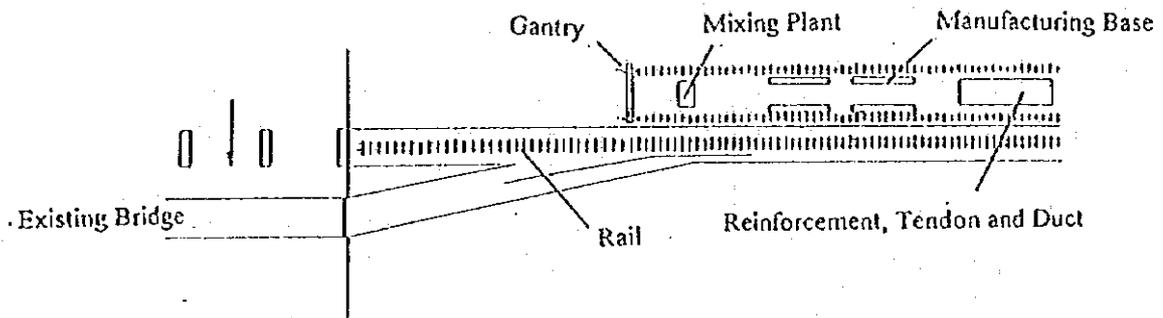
Fabrication Yard for Post-tensioned Beam
